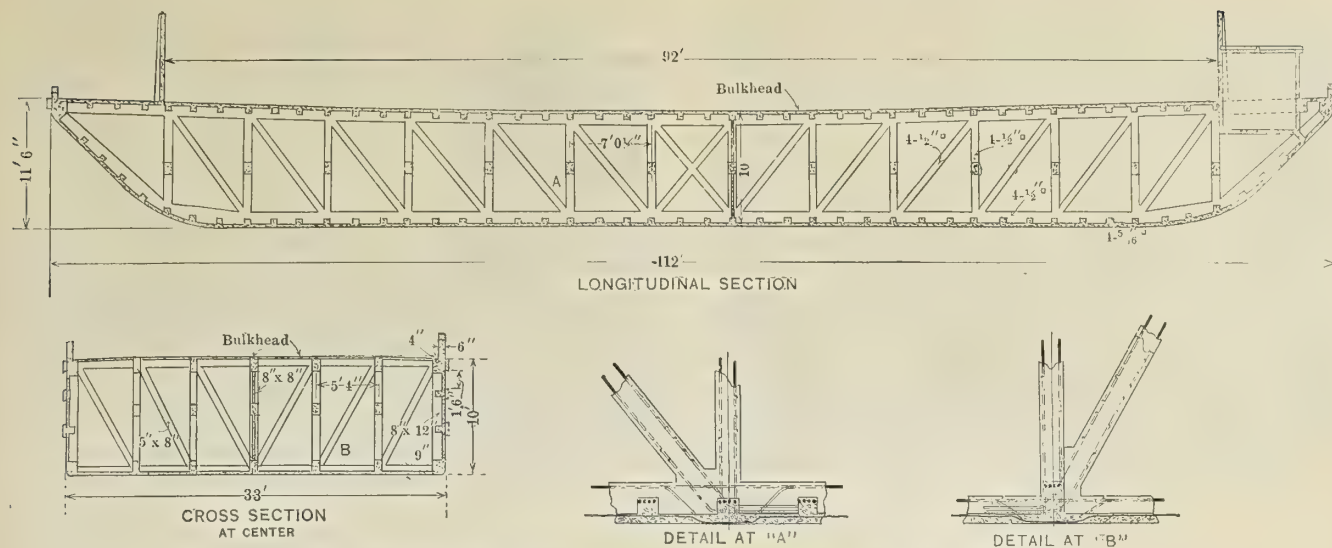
Longitudinal Section, Midship Section and Details of Strut Construction
